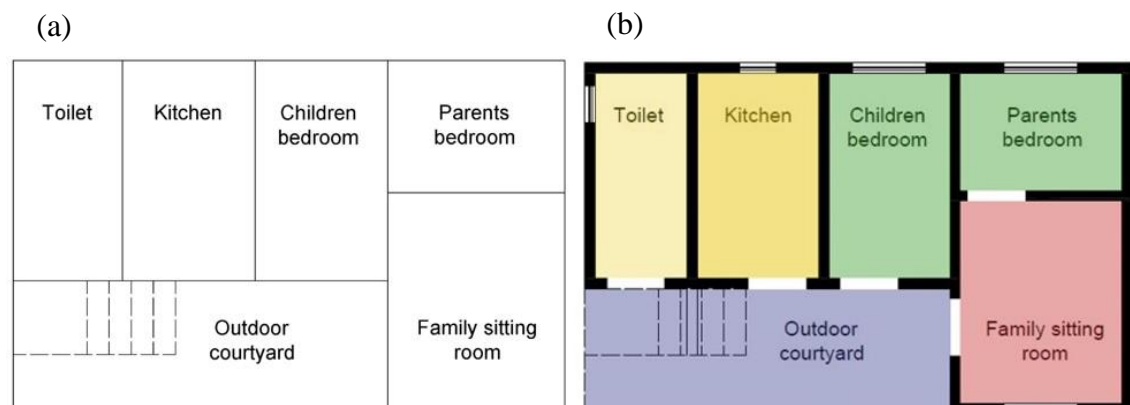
Azraq camp- Group 2: a) Zoning of spaces, b) Plan with openings
